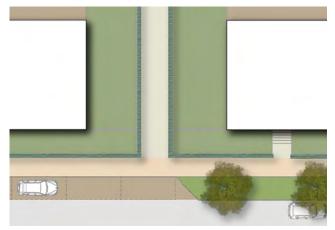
Illustrative diagram showing an indicative layout of on-street inset parking.
